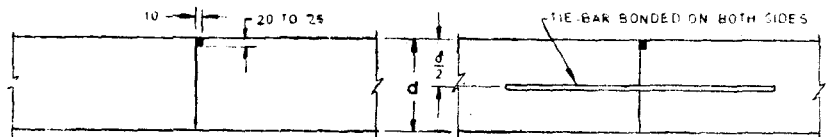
EXPANSION JOINT FOR PSC PAVEMENT
